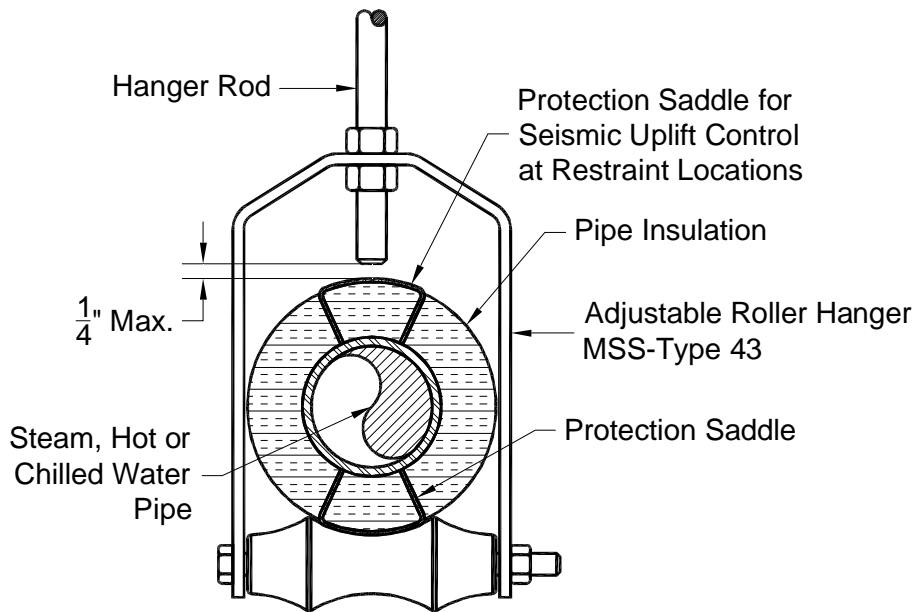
; Roller Type Clevis Hanger Used for Hot and Cold Fluid Lines
